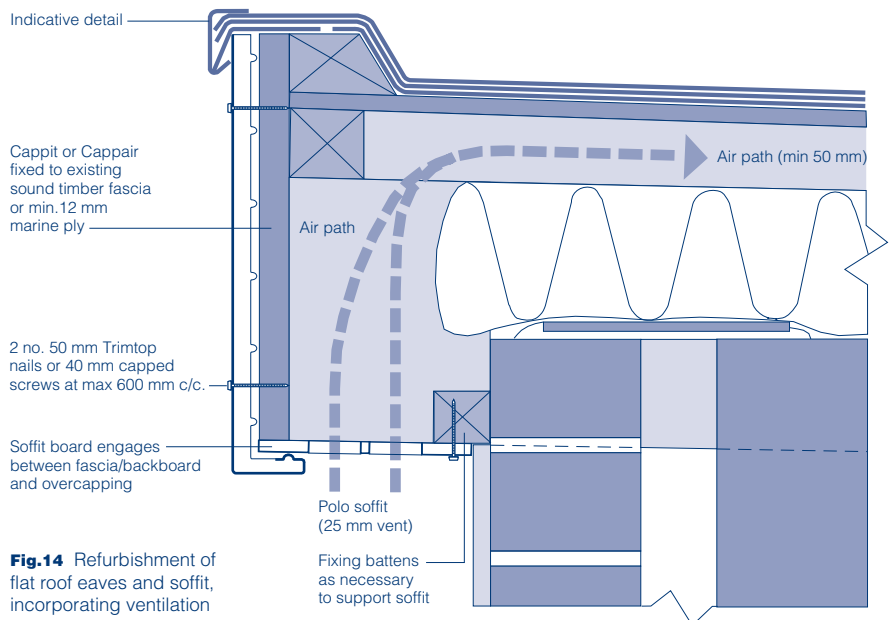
Refurbishment of flat roof eaves and soffit, incorporating ventilation
